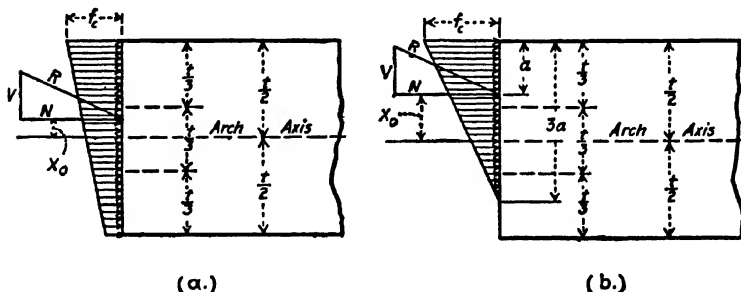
Stresses caused by forces acting on plain concrete section.
